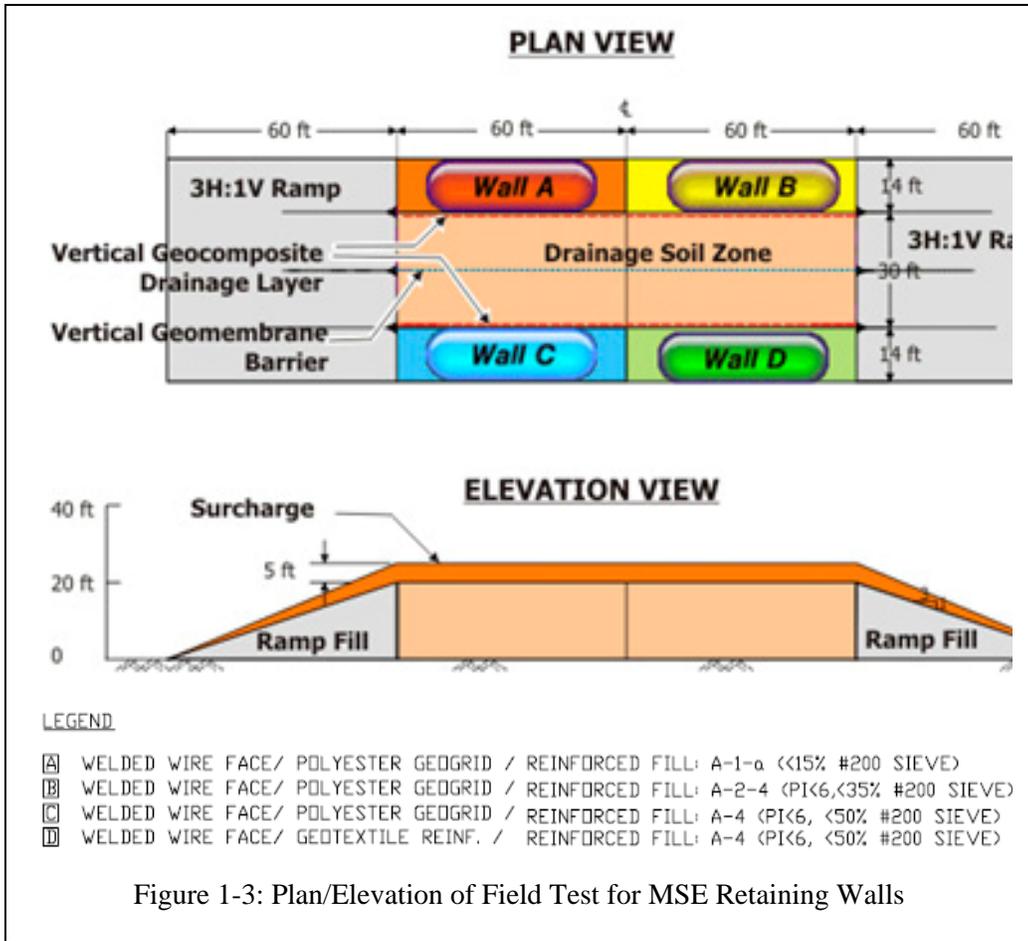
Plan/Elevation of Field Test for MSE Retaining Walls
